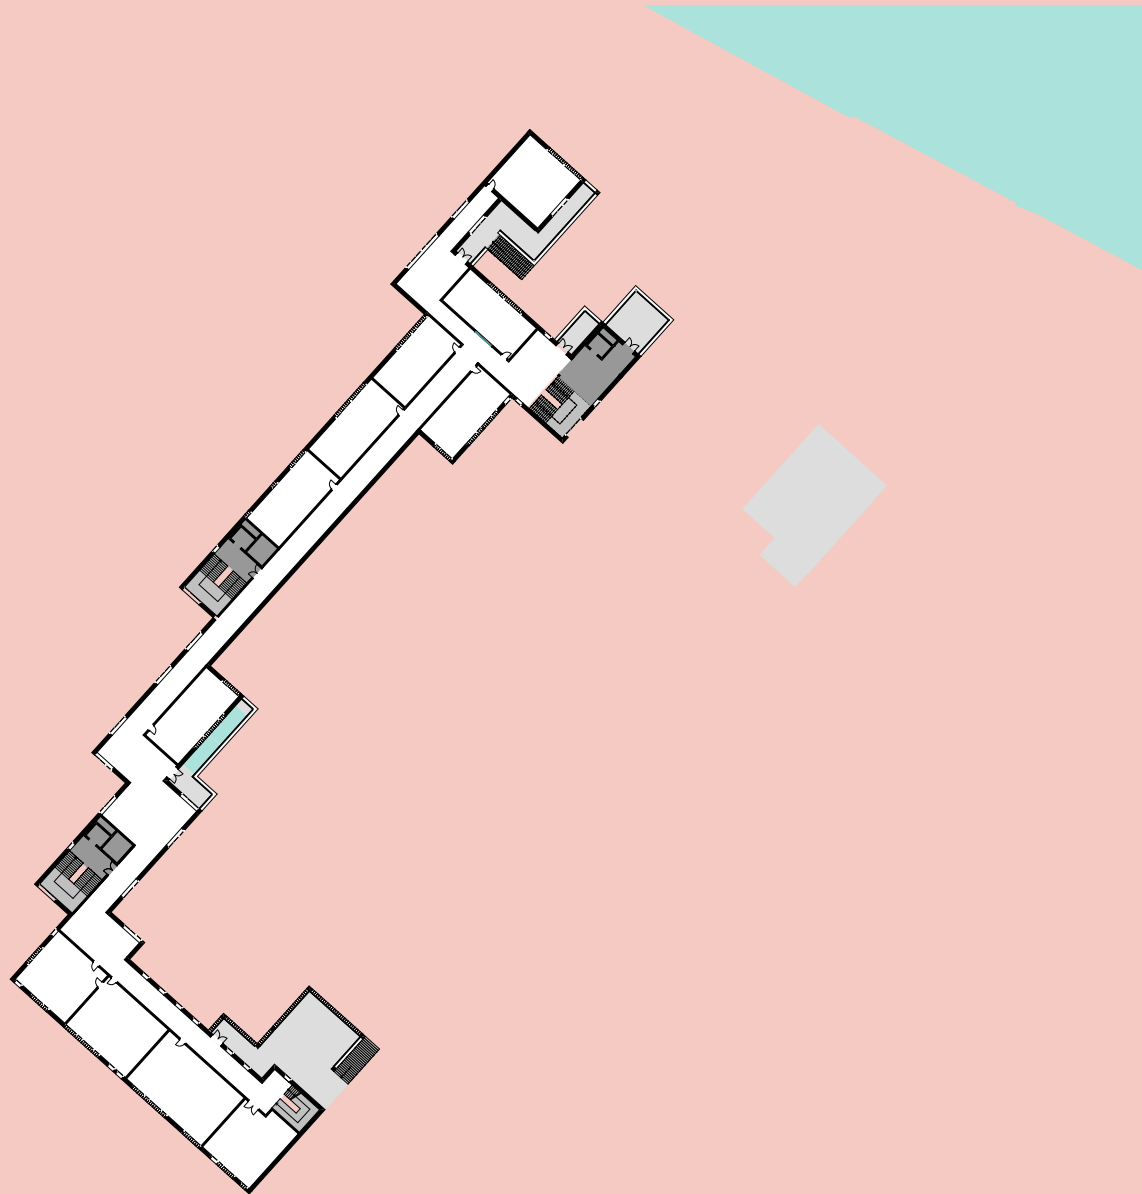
fourth floor (+4), floor plan, scale 1:1000
